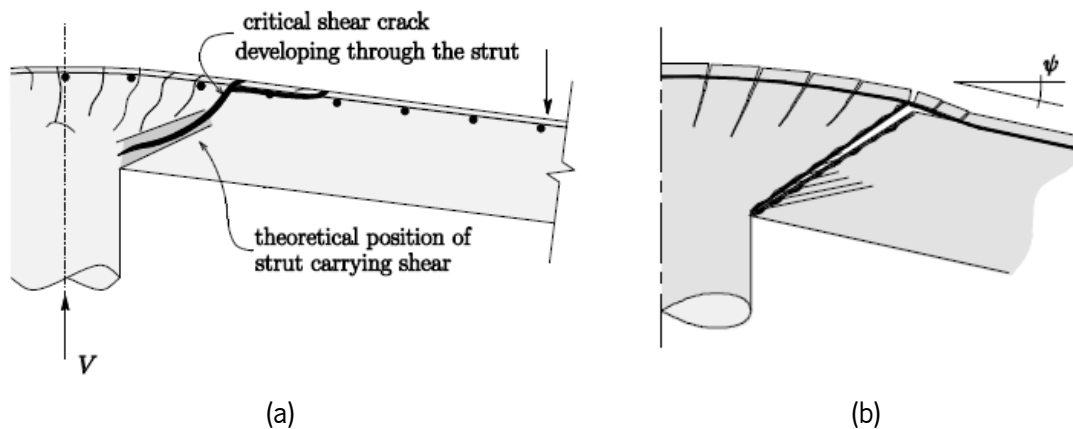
Punching of slab. a) Development of critical shear crack; b) Slab's rotation and concrete cover spalling (extracted from [67]).
